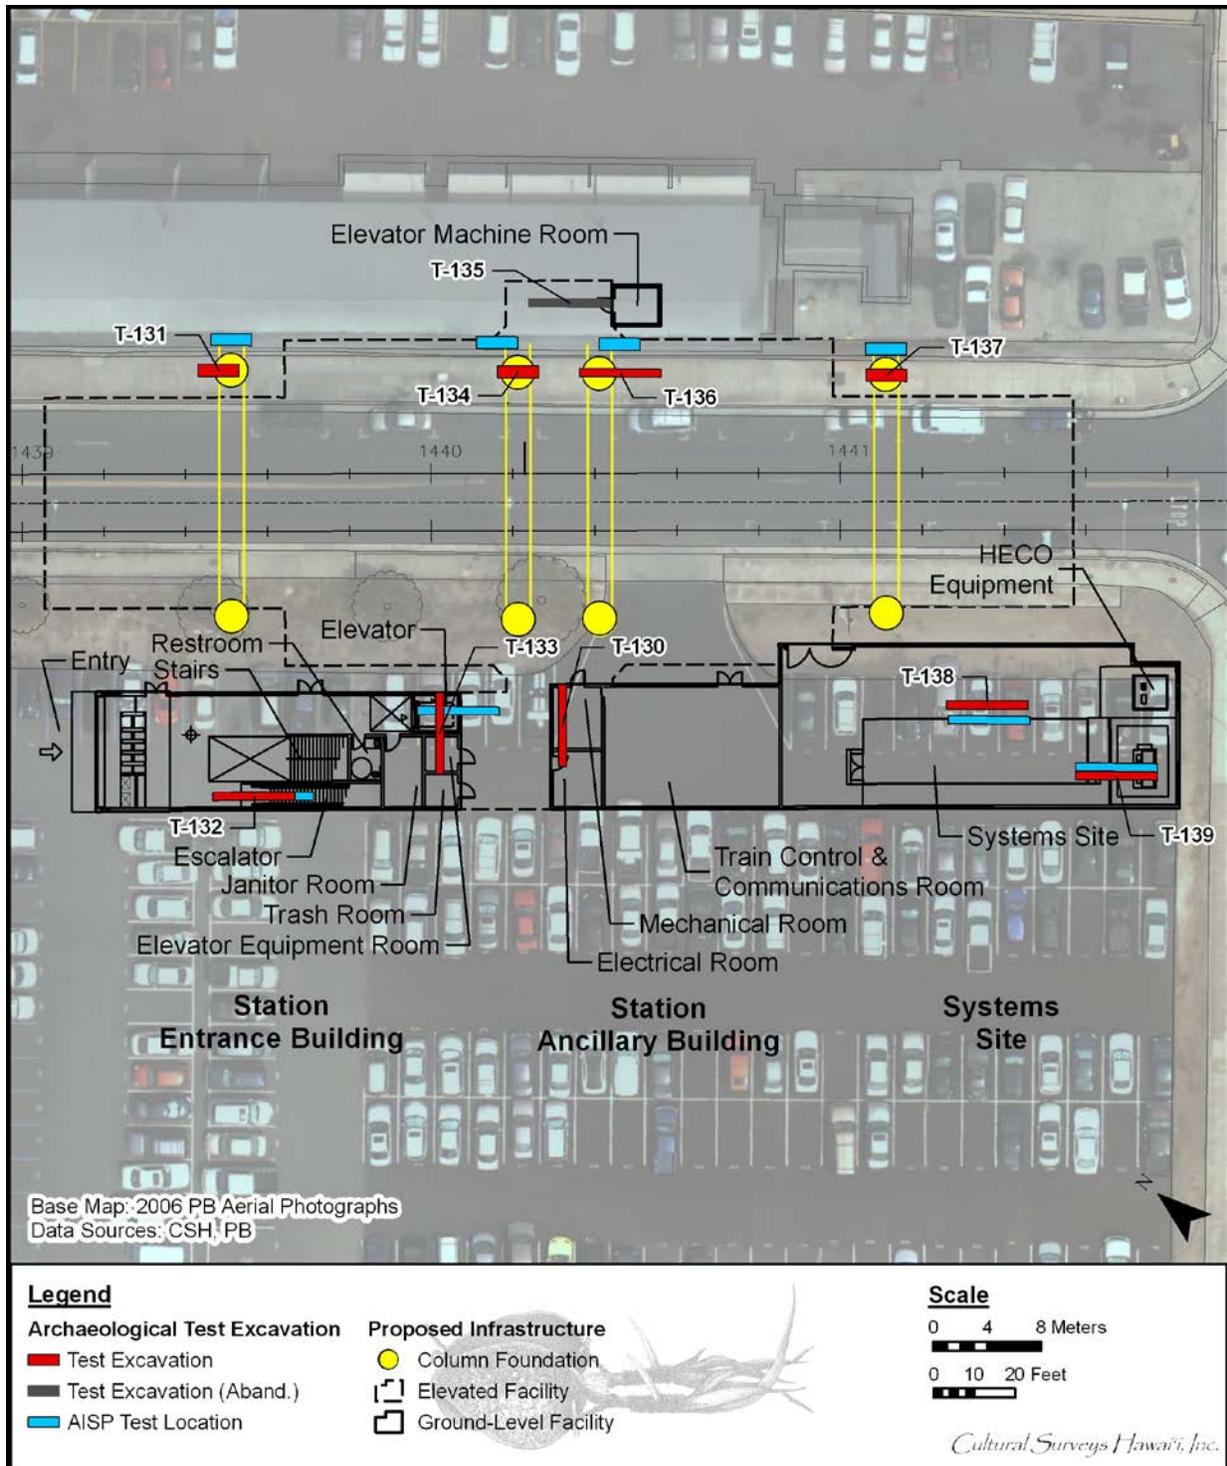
Civic Center Station, detail of (makai) Station Entrance Building (at makai side of Halekauwila Street northwest of Keawe Street), showing locations of proposed AISP and actual AIS test excavations
